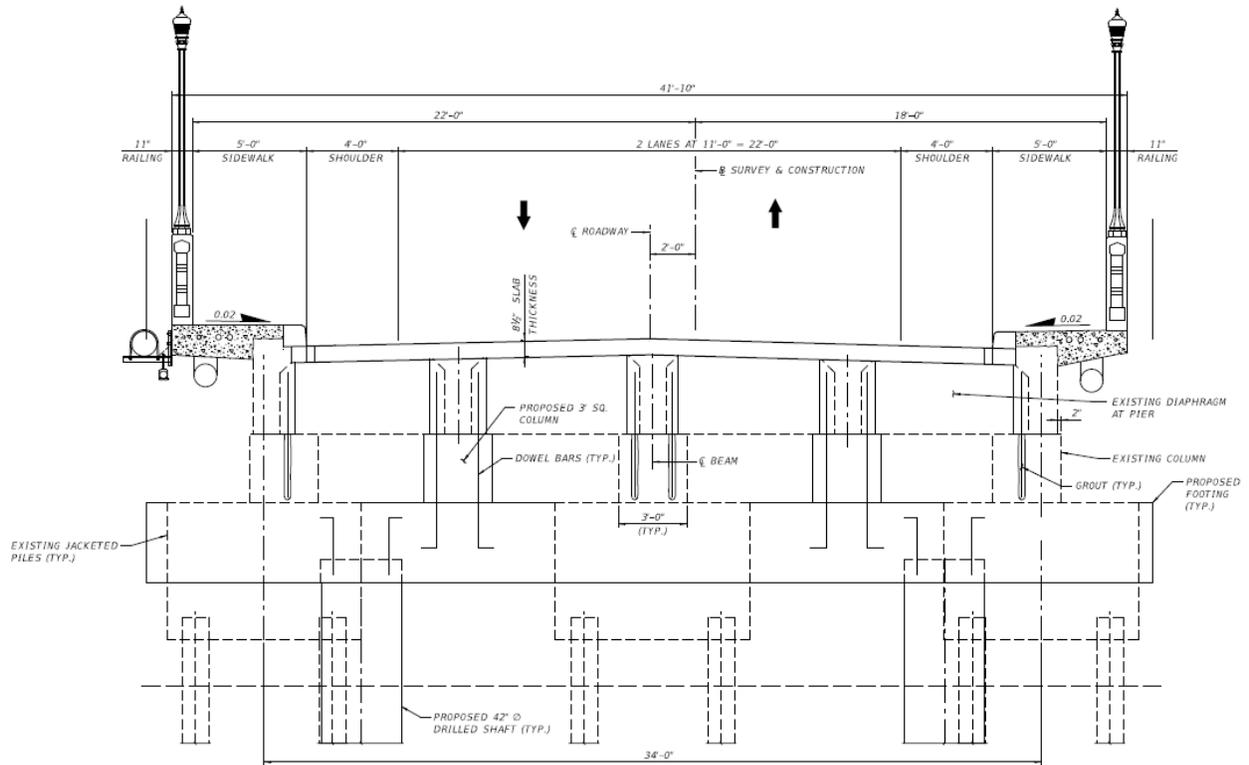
Rehabilitation Alternative 4: Beam and Foundation Strengthening Concept
